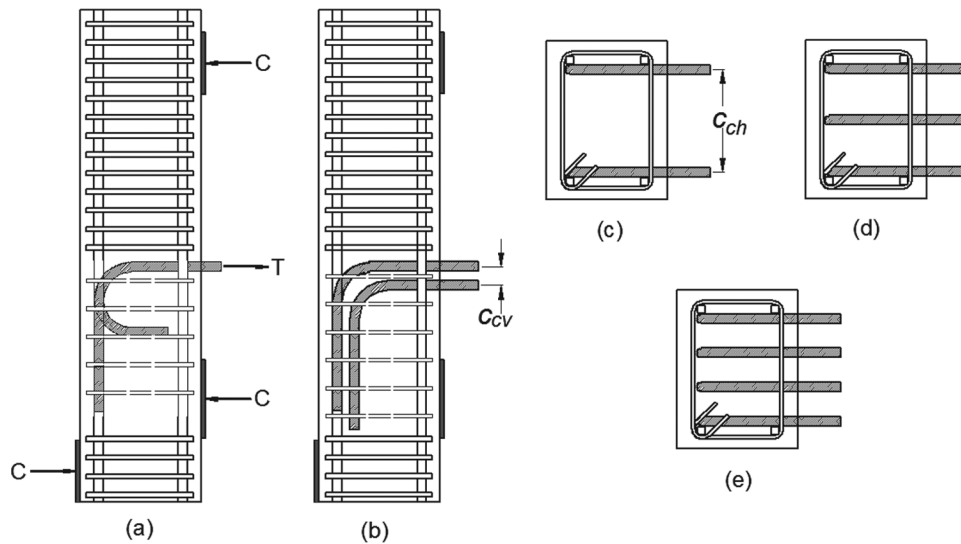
Schematic of test specimens: (a) side view of specimen with hooks in one layer; (b) side view of specimen with staggered hooks; (c) plan view of specimen with two hooks; (d) plan view of specimen with three hooks; and (e) plan view of specimen with four hooks.
